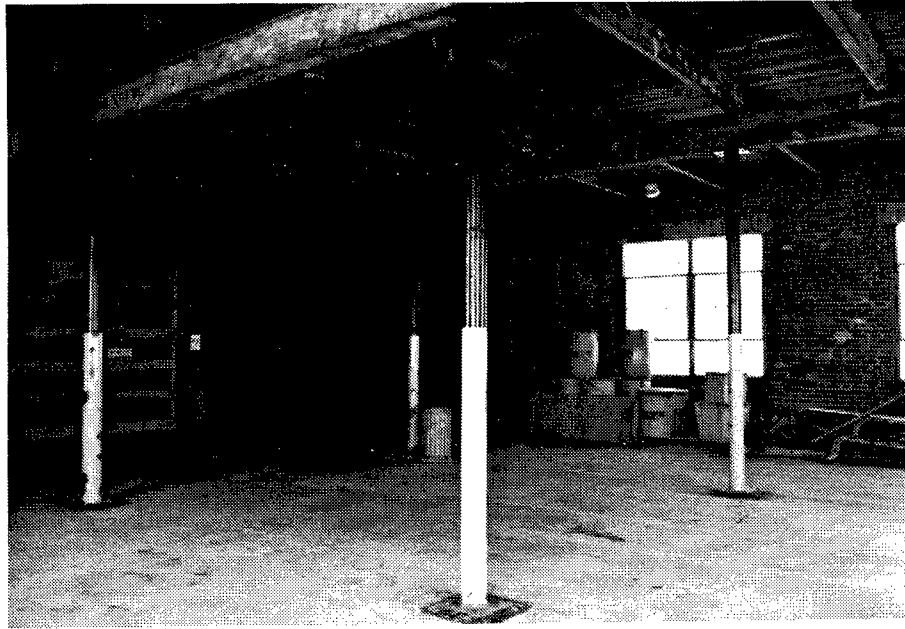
Building C1: Interior of Hexamine Solution Storage Building.
